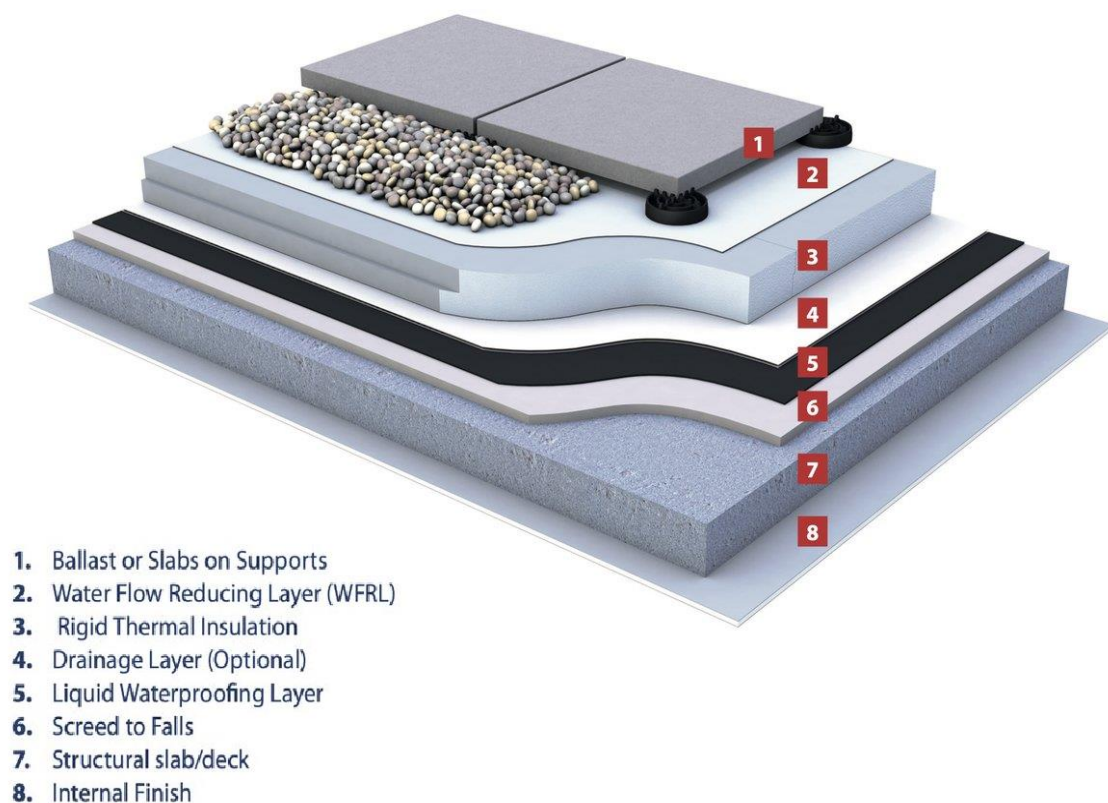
Example of inverted flat roof structure (adapted from LRWA)
